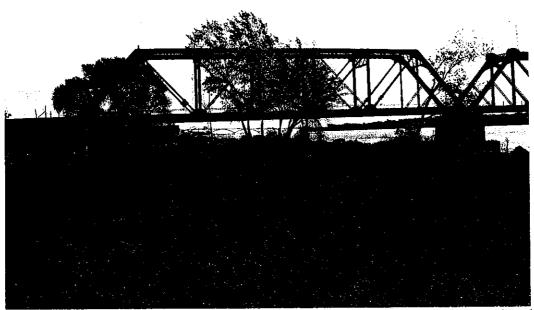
The south elevation of the International Railroad Bridge over the Niagara River from Squaw Island, facing west-northwest (PCI 2005).
